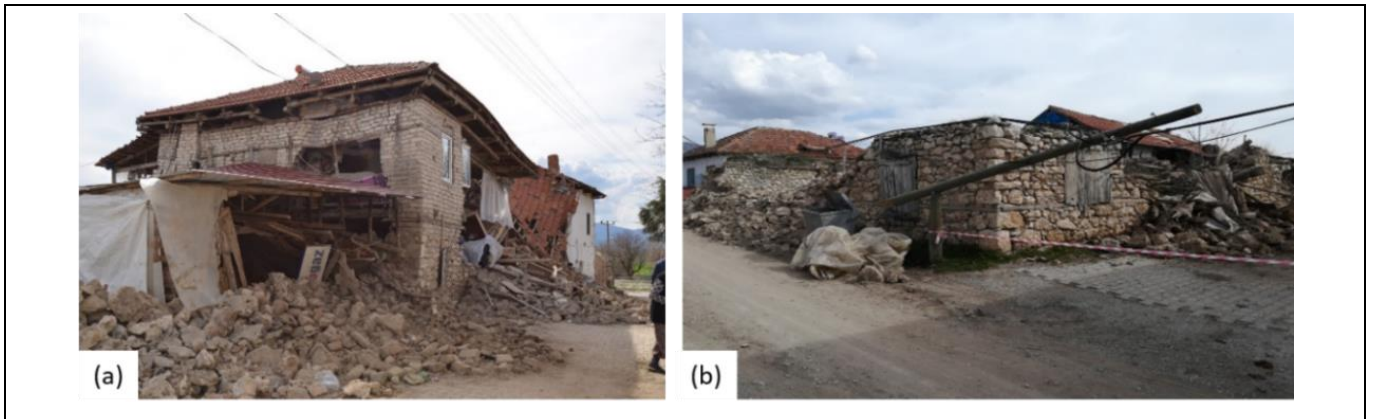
(a): Collapsed adobe structure, (b): heavily damaged masonry structure and broken electric pole in Uçarı village.
